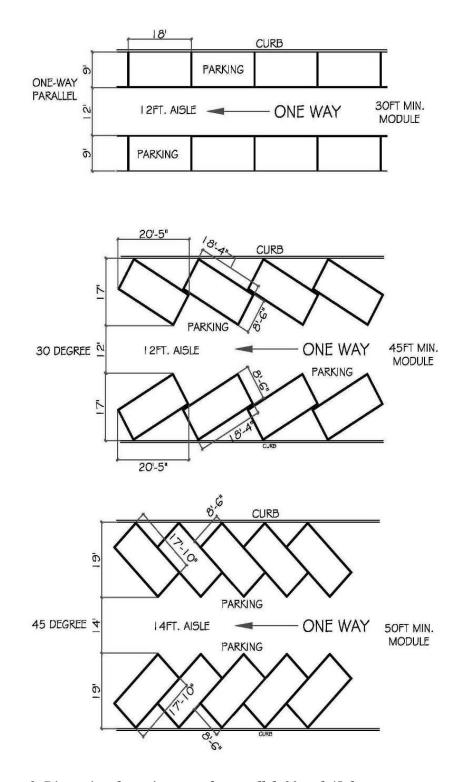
Dimensional requirements for parallel, 30 and 45 degree two row parking
